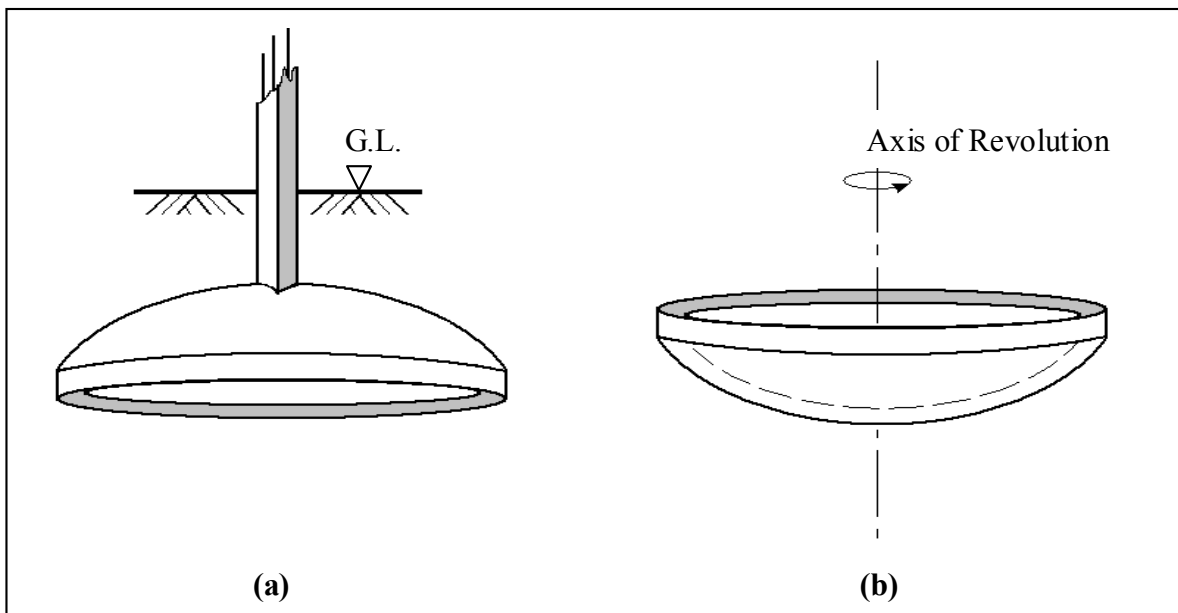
Dome Shell Footings: (a) Upright (b) Inverted.
